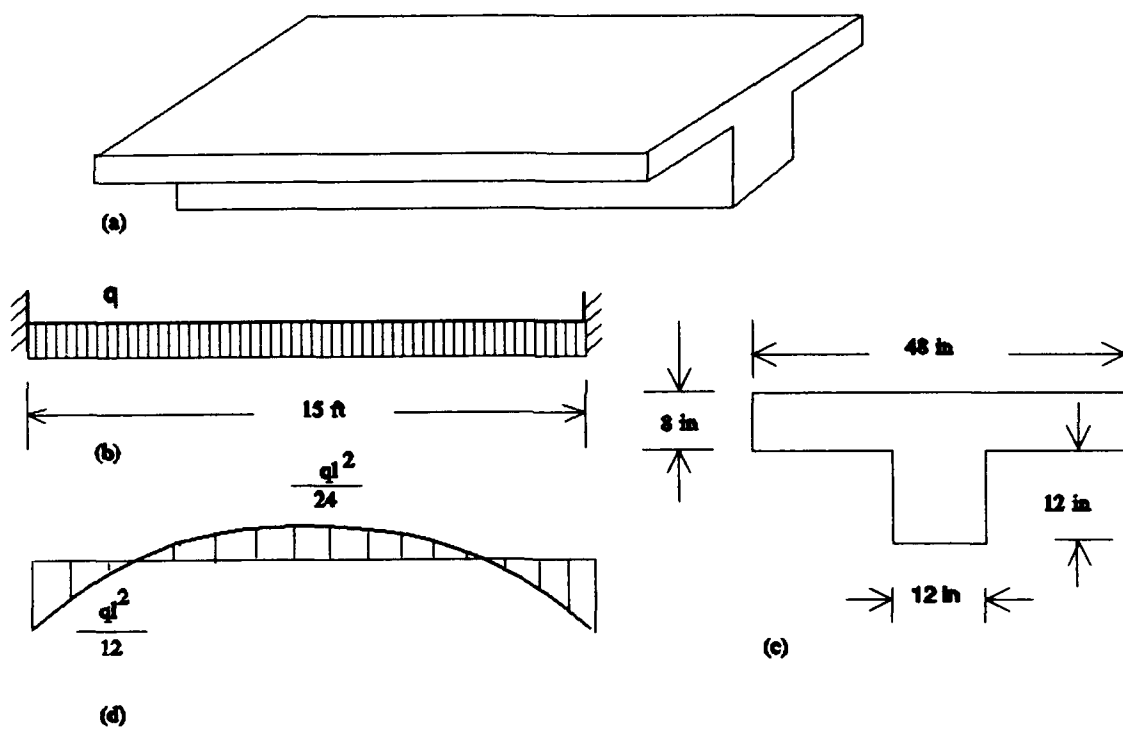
A MODEL FOR THE STRENGTHENING BEAM UNDER THE BOTTOM SLAB
